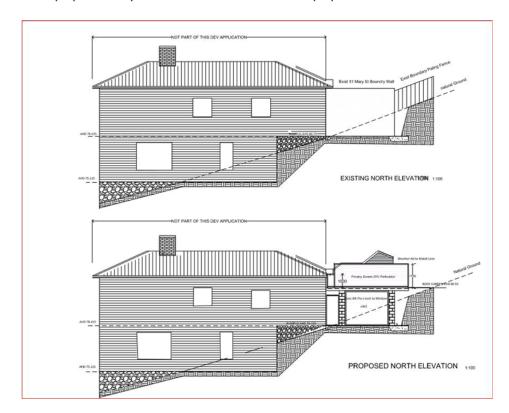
proposed northern elevation (facing 31 Mary Street)
